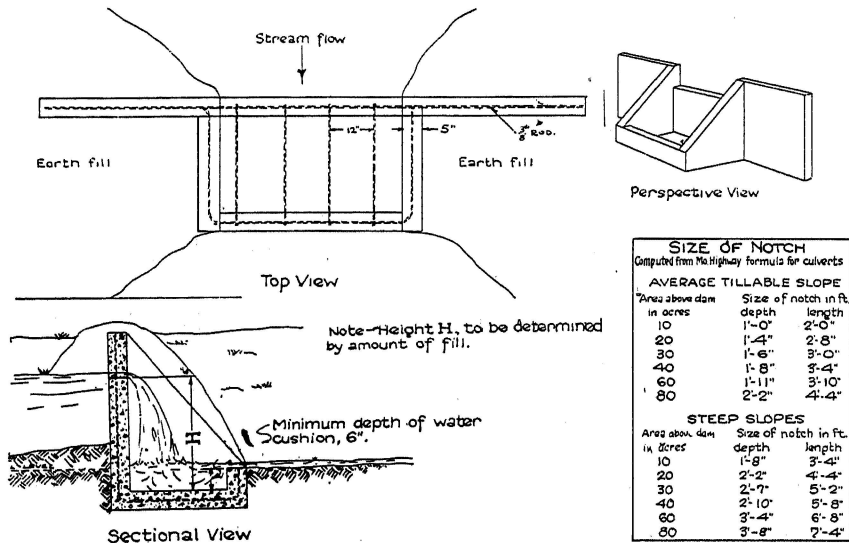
Plan for rectangular notch concrete dam, showing size of notch to use.
